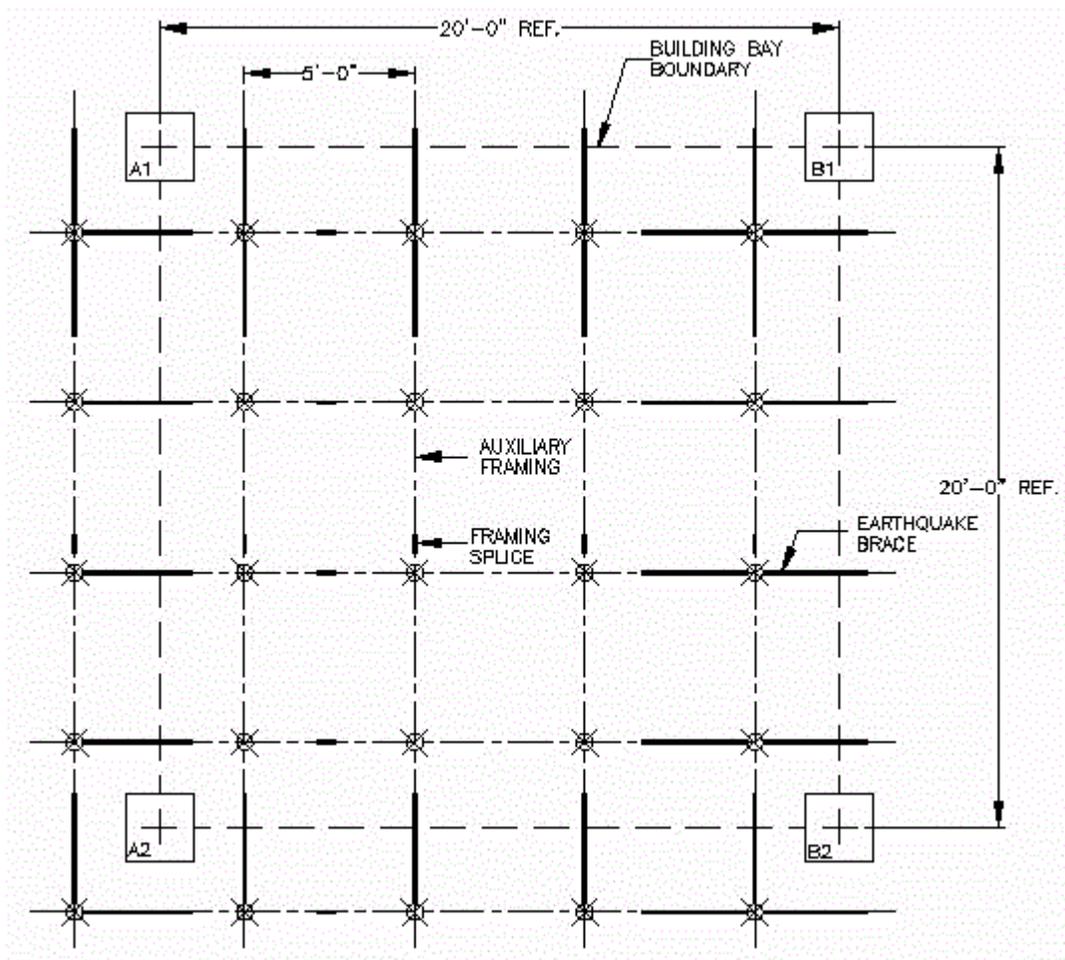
illustrates the single level auxiliary framing and bracing layout used to determine the overall building bay weight information provided in Figure 6 through 11 superstructure arrangements. The following auxiliary framing and earthquake bracing characteristics are illustrated in Figure 5:
